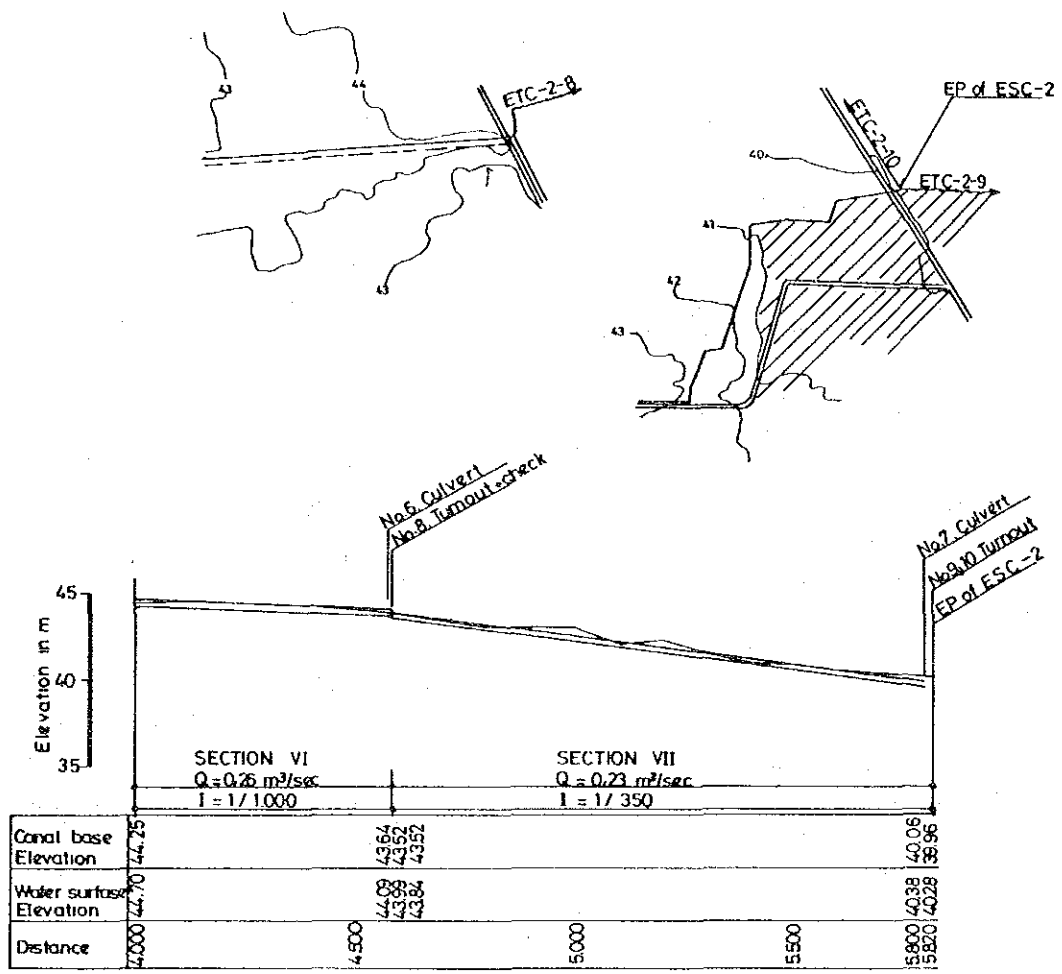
PLAN AND PROFILE OF ESC - 2 (1/2)
